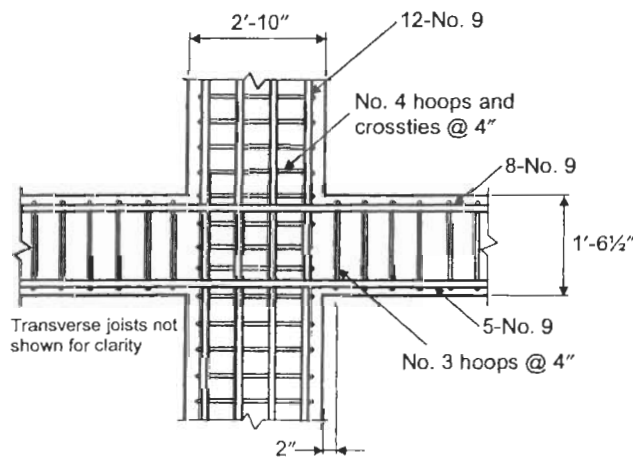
Reinforcement Details at Interior Beam-Column Joint (SDC D)
